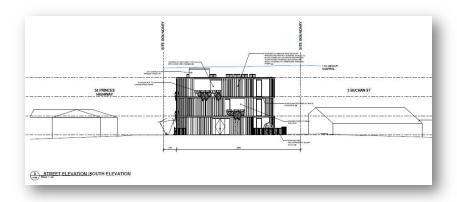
Street elevation, showing the building within the 11 metre height limit (blue line)
